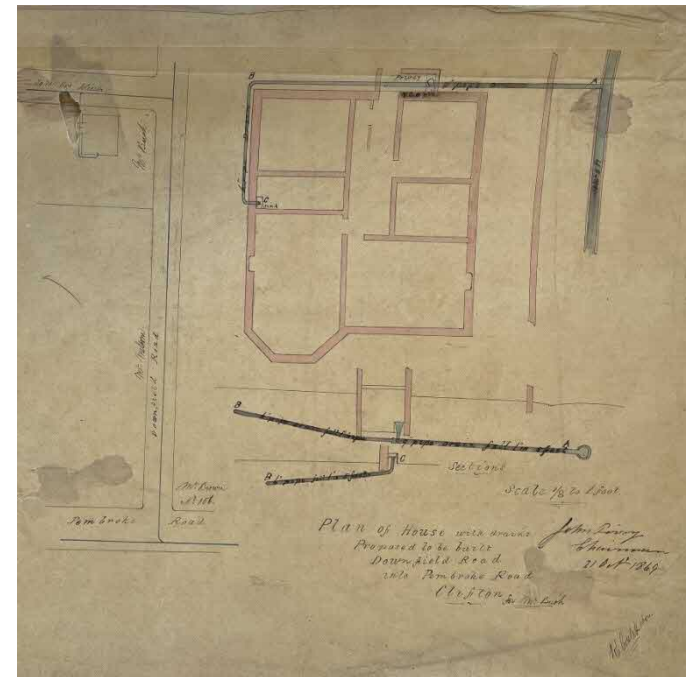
Drawings from the 1868 application for the house. The drawings show the basement plan and details of the drainage connection.
